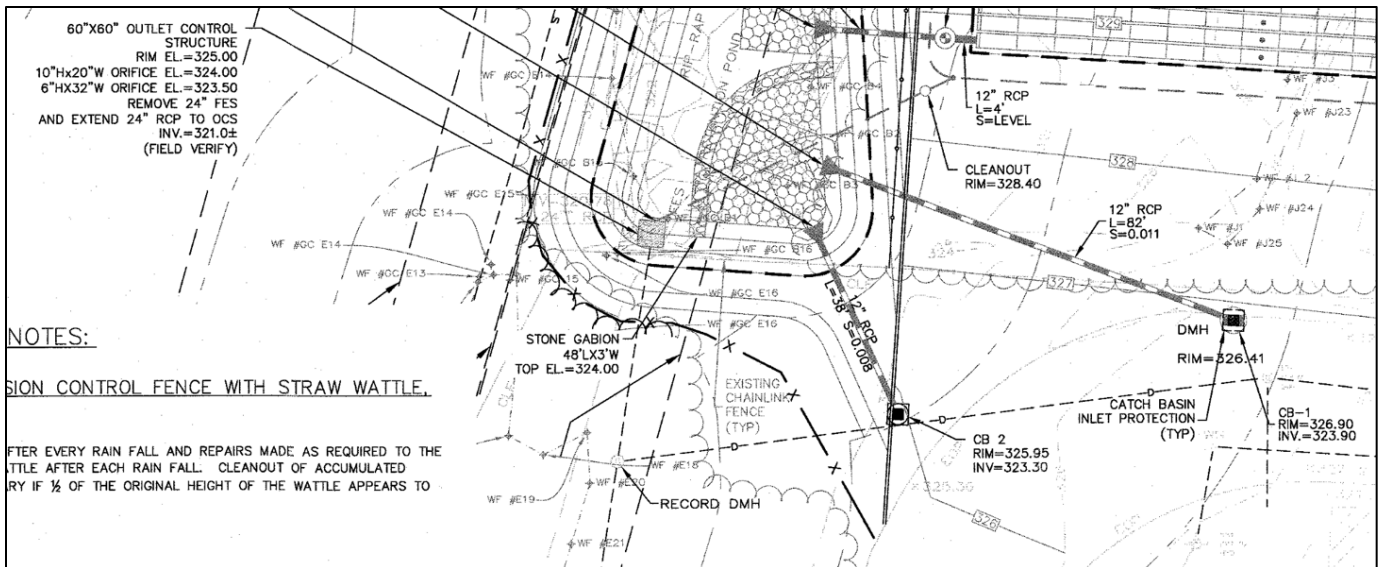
Portion of site plan showing proposed tie-in to existing drainage system at southern end of B-series stormwater IVW.
